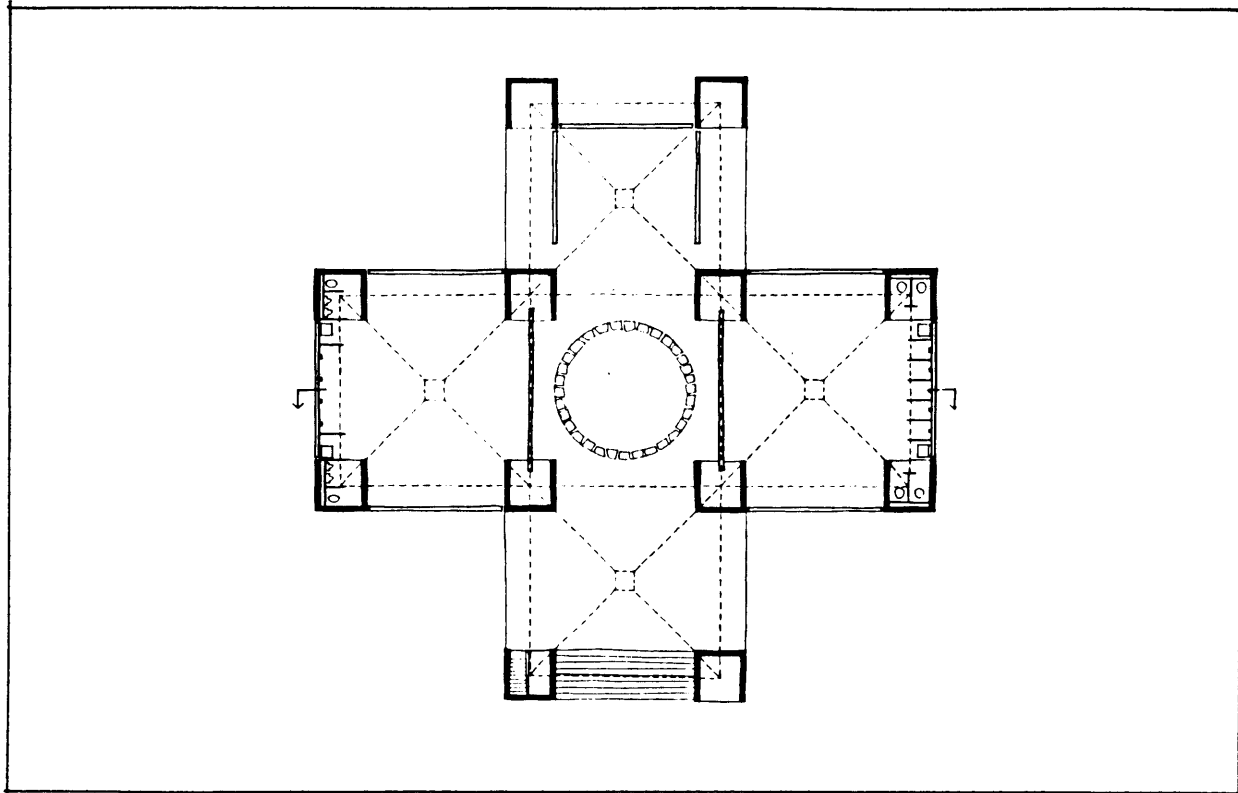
Plan of Trenton Bath House showing habitable columns.
